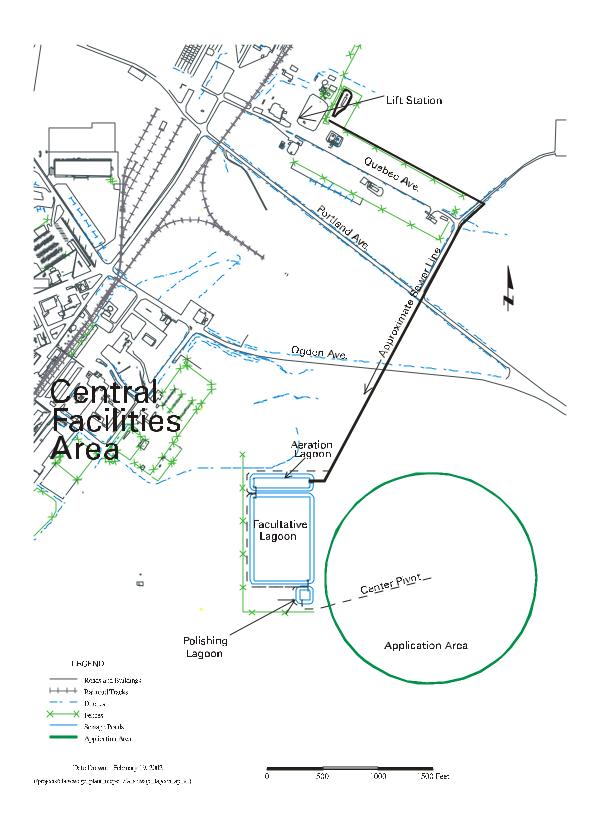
Central Facilities Area Sewage Treatment Plant.
